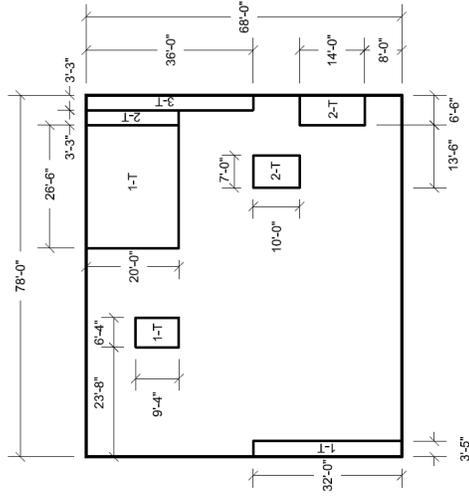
H.6-70: PUMP HOUSE WEST WALL LOOKING EAST
